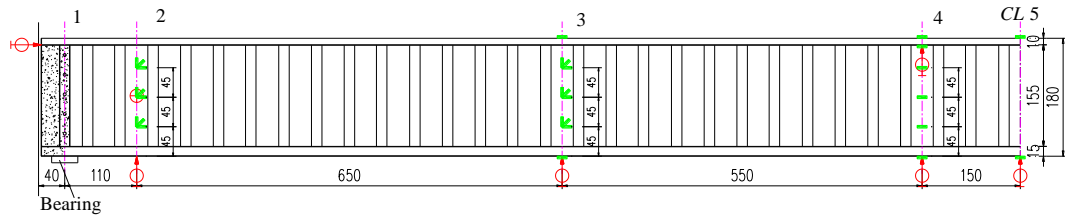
Test specimen and instruments of composite box girder with corrugated webs
